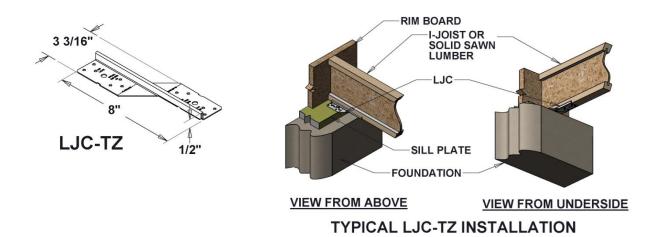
LJC-TZ LATERAL JOIST CONNECTOR
